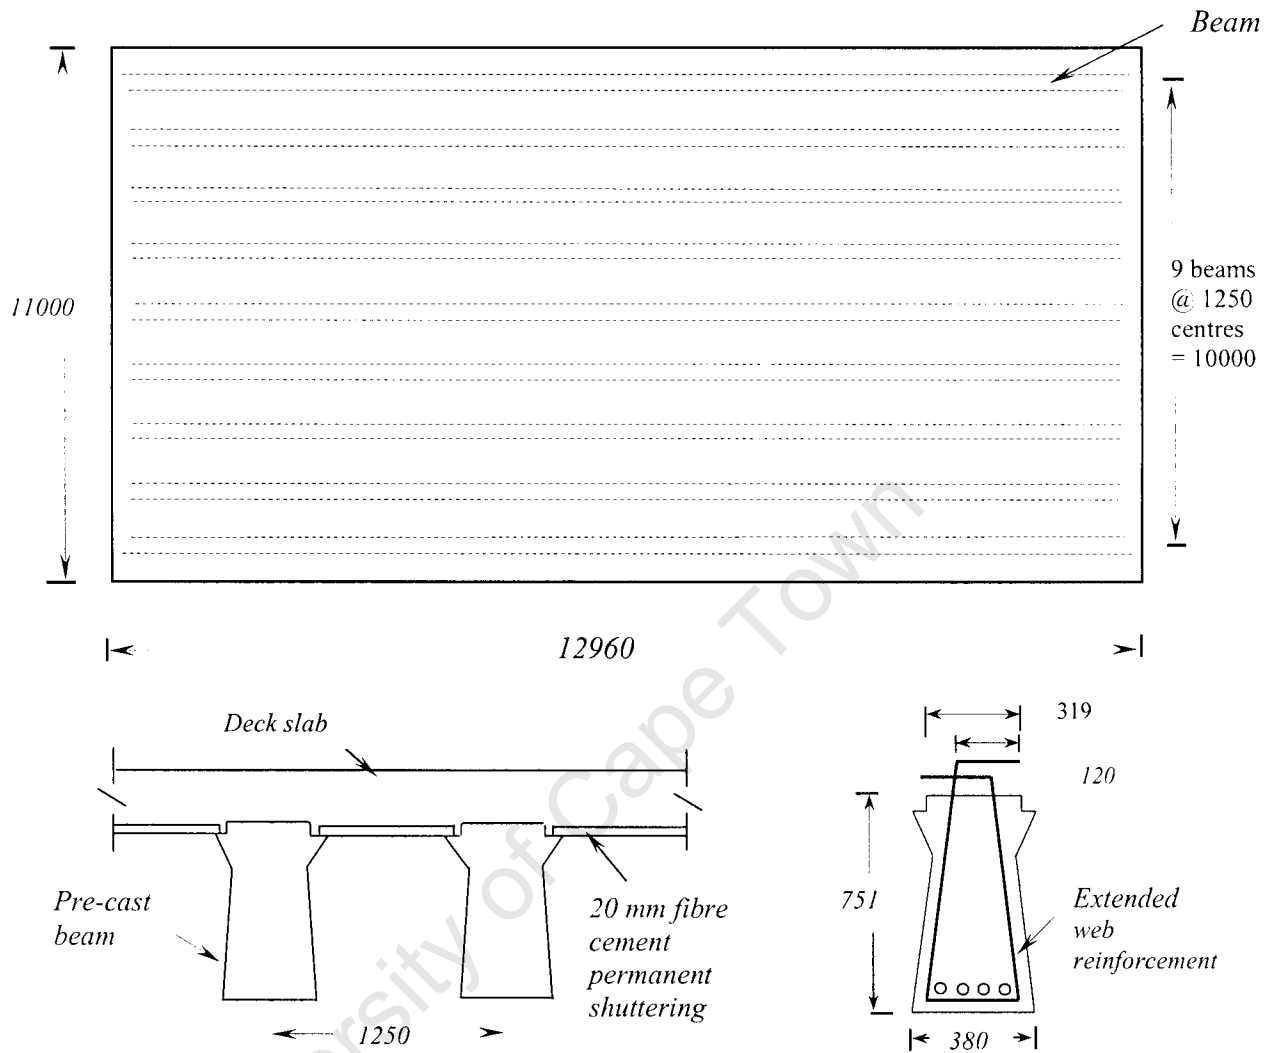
Plan, section and beam details for one of the spans (All units in mm)
